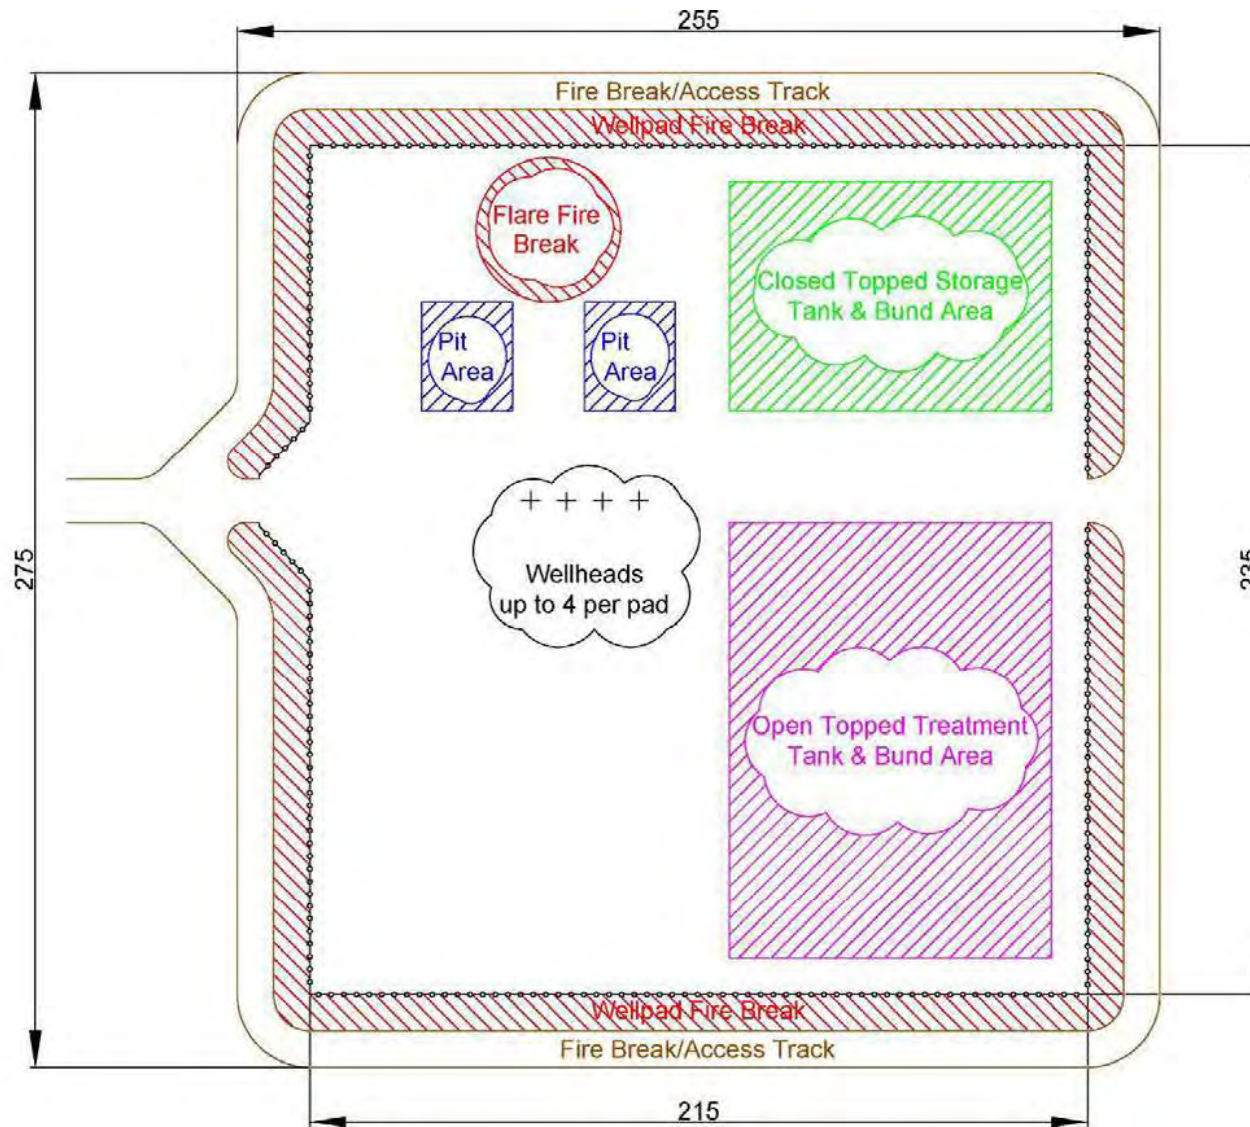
EP187 Multiwell Wellpad footprint with indicative tanks layout, where cut and fill is not required
